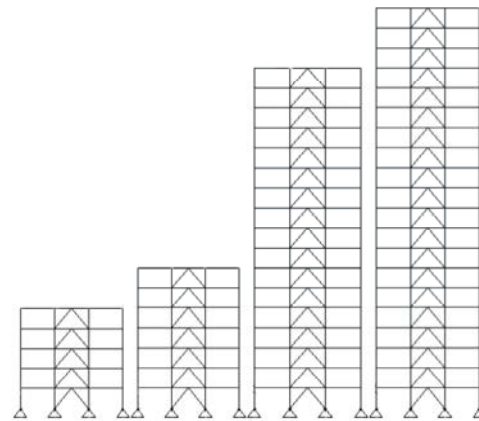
Frame elevations of low-rise (5-, 7- story) and high-rise (17-, 20- story) steel Frames
